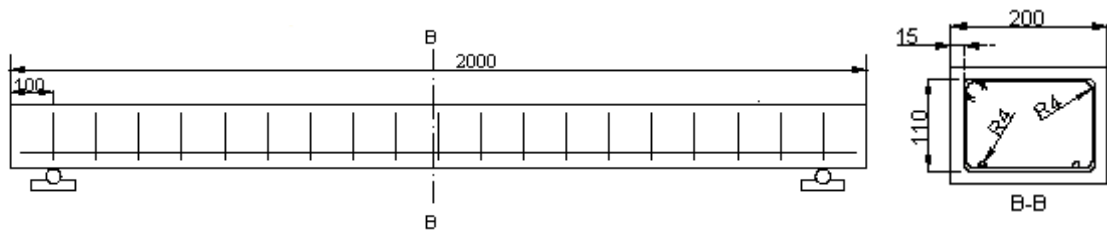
Geometry of the specimens with stirrups all along the length
